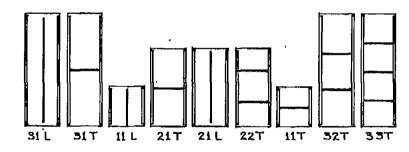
FORMS AND DIMENSIONS OF TEST PANELS
